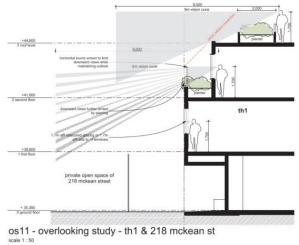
effect of screening SCR3 to overlooking beyond to dwellings fronting McKean Street.
